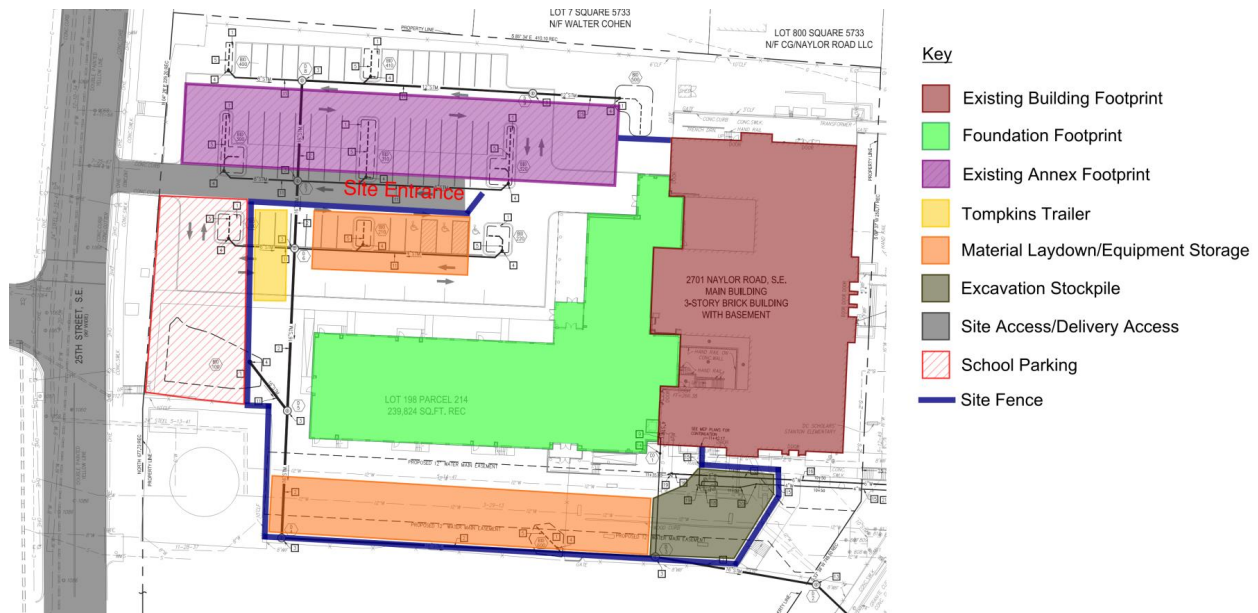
End of Foundation Phase Site Utilization Plan – Transition to Superstructure Site Utilization
